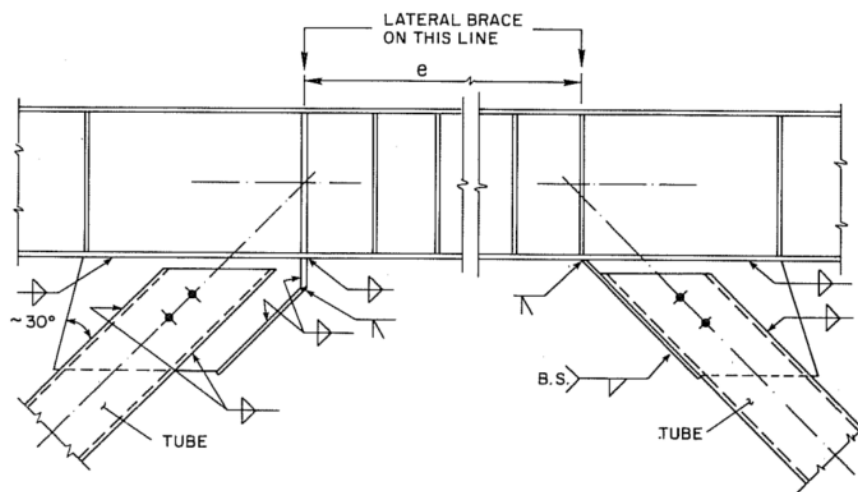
Typical detail for hollow section braces to beam connection (Popov and Engelhardt 1988)
